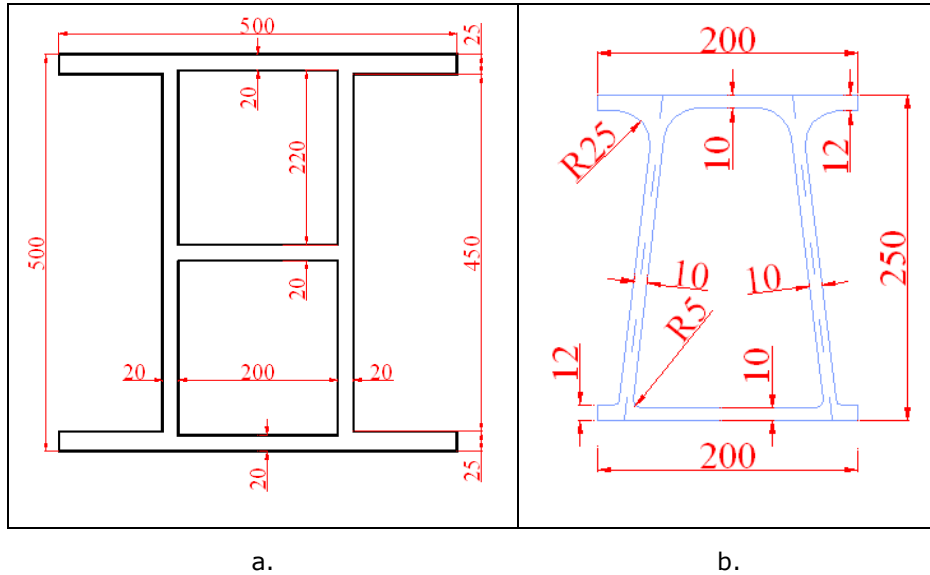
4. Cross-sections. a. Main girder; b. Extruded profile
